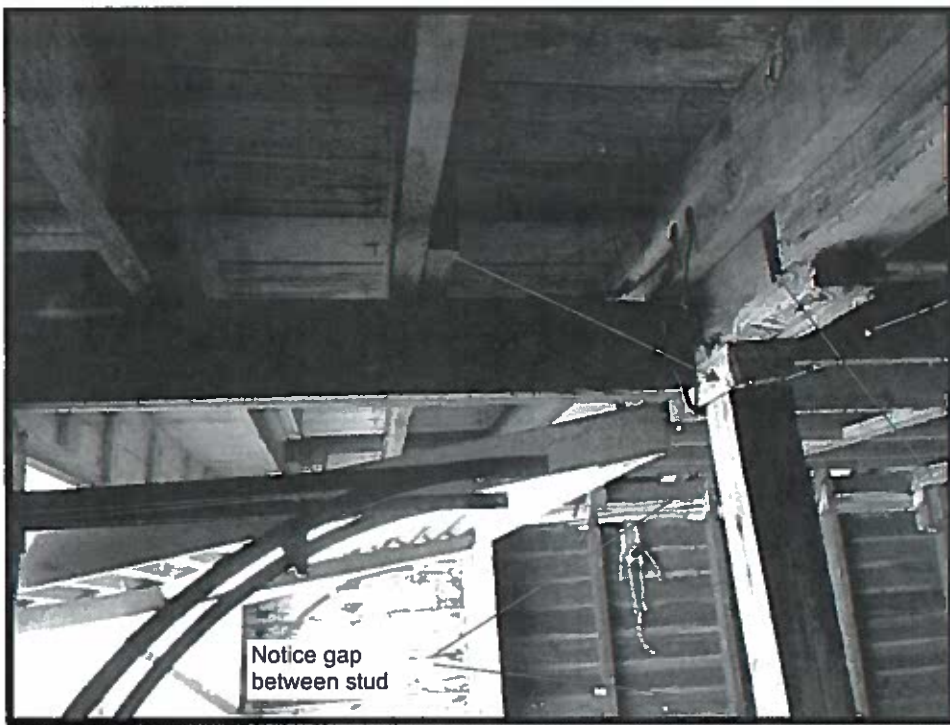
; Additions, Northern porch, support girder/existing lintel connection at column
